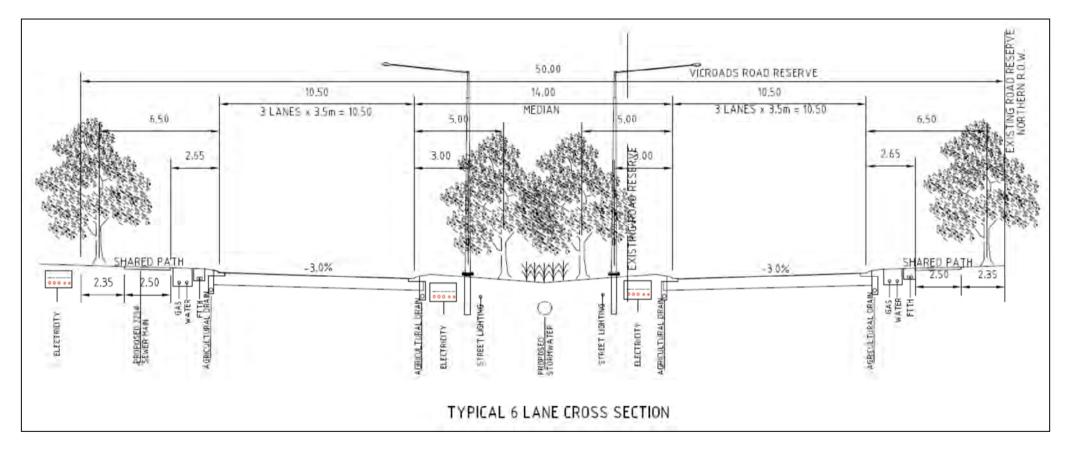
Cross section proposed for Donnybrook Road (Source: Functional Layout Plan produced by SMEC on behalf of Merrifield Corporation in 2011 for VicRoads)
